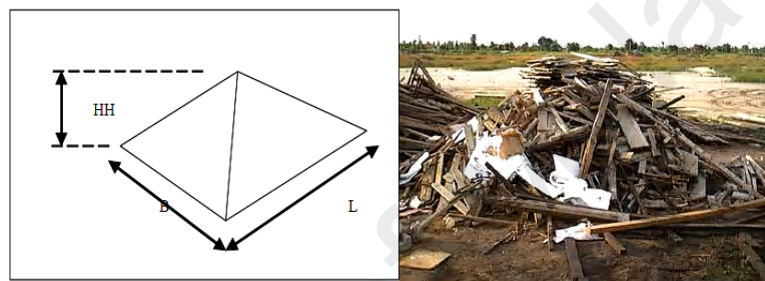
Stockpiled Waste (Source: Lau et al., 2008)
